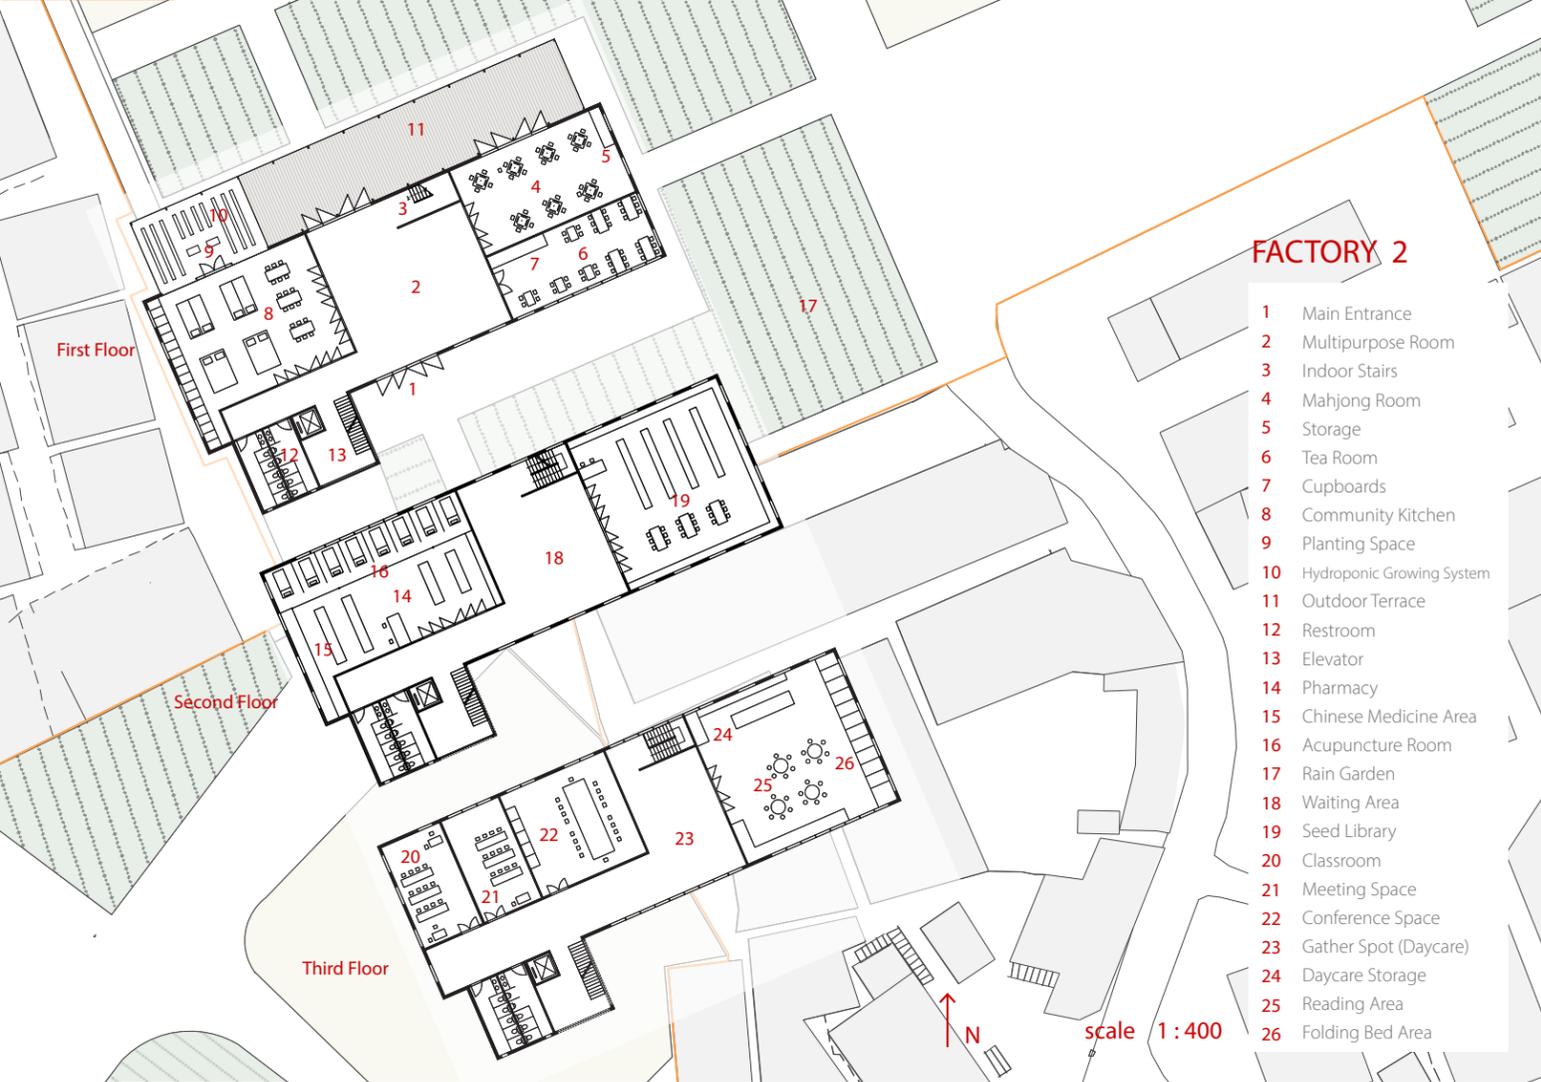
Proposed Floor Plan of Factory 2, photo by author
